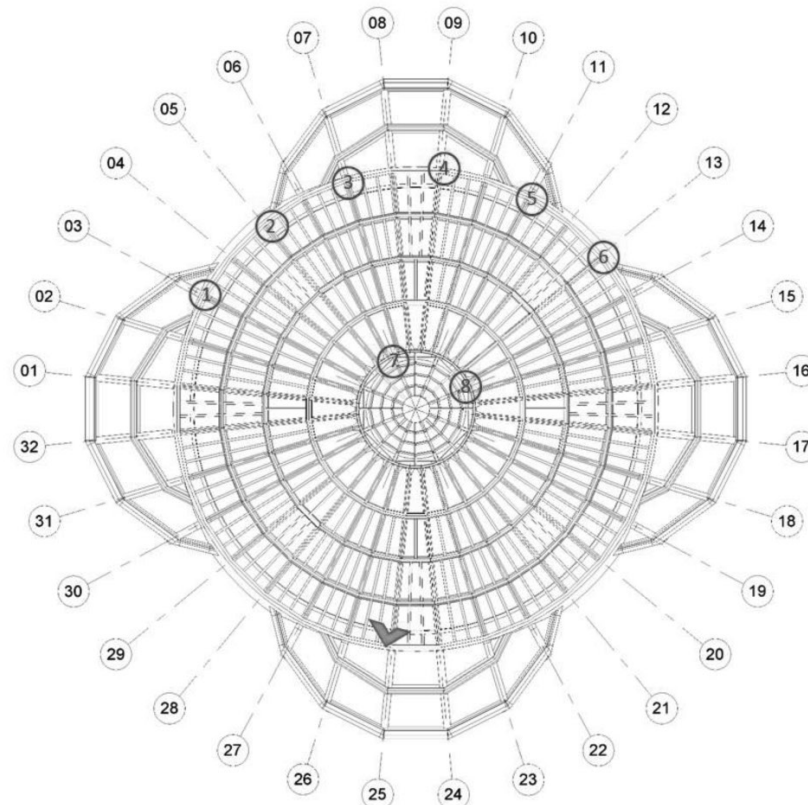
The arrangement of the tacheometer and prisms – the floor plan of the structure of the Centennial Hall.
